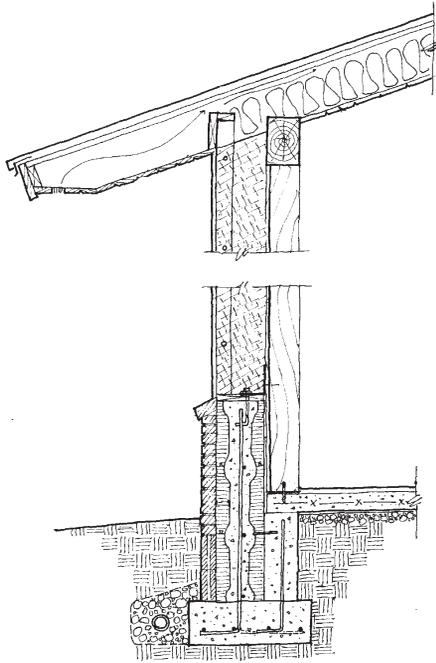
Section through an Econest, showing stem wall, straw-clay wall, timber frame and vented, insulated roof.
